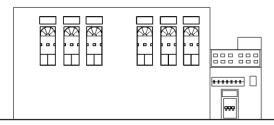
South elevation of a traditional building in Bushehr (Memarian, 2006)
